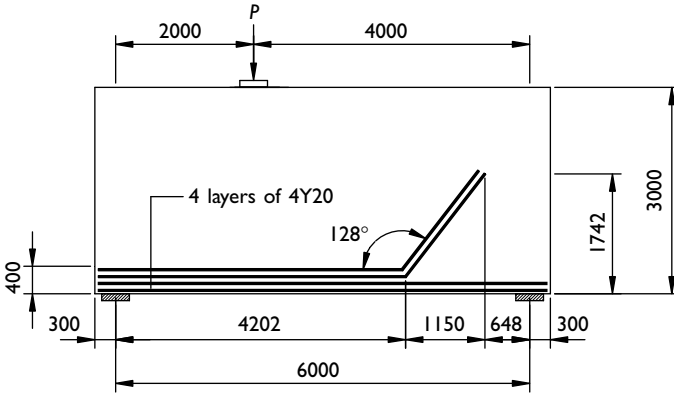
Layout of main steel reinforcement in the deep beam under one-point load.
